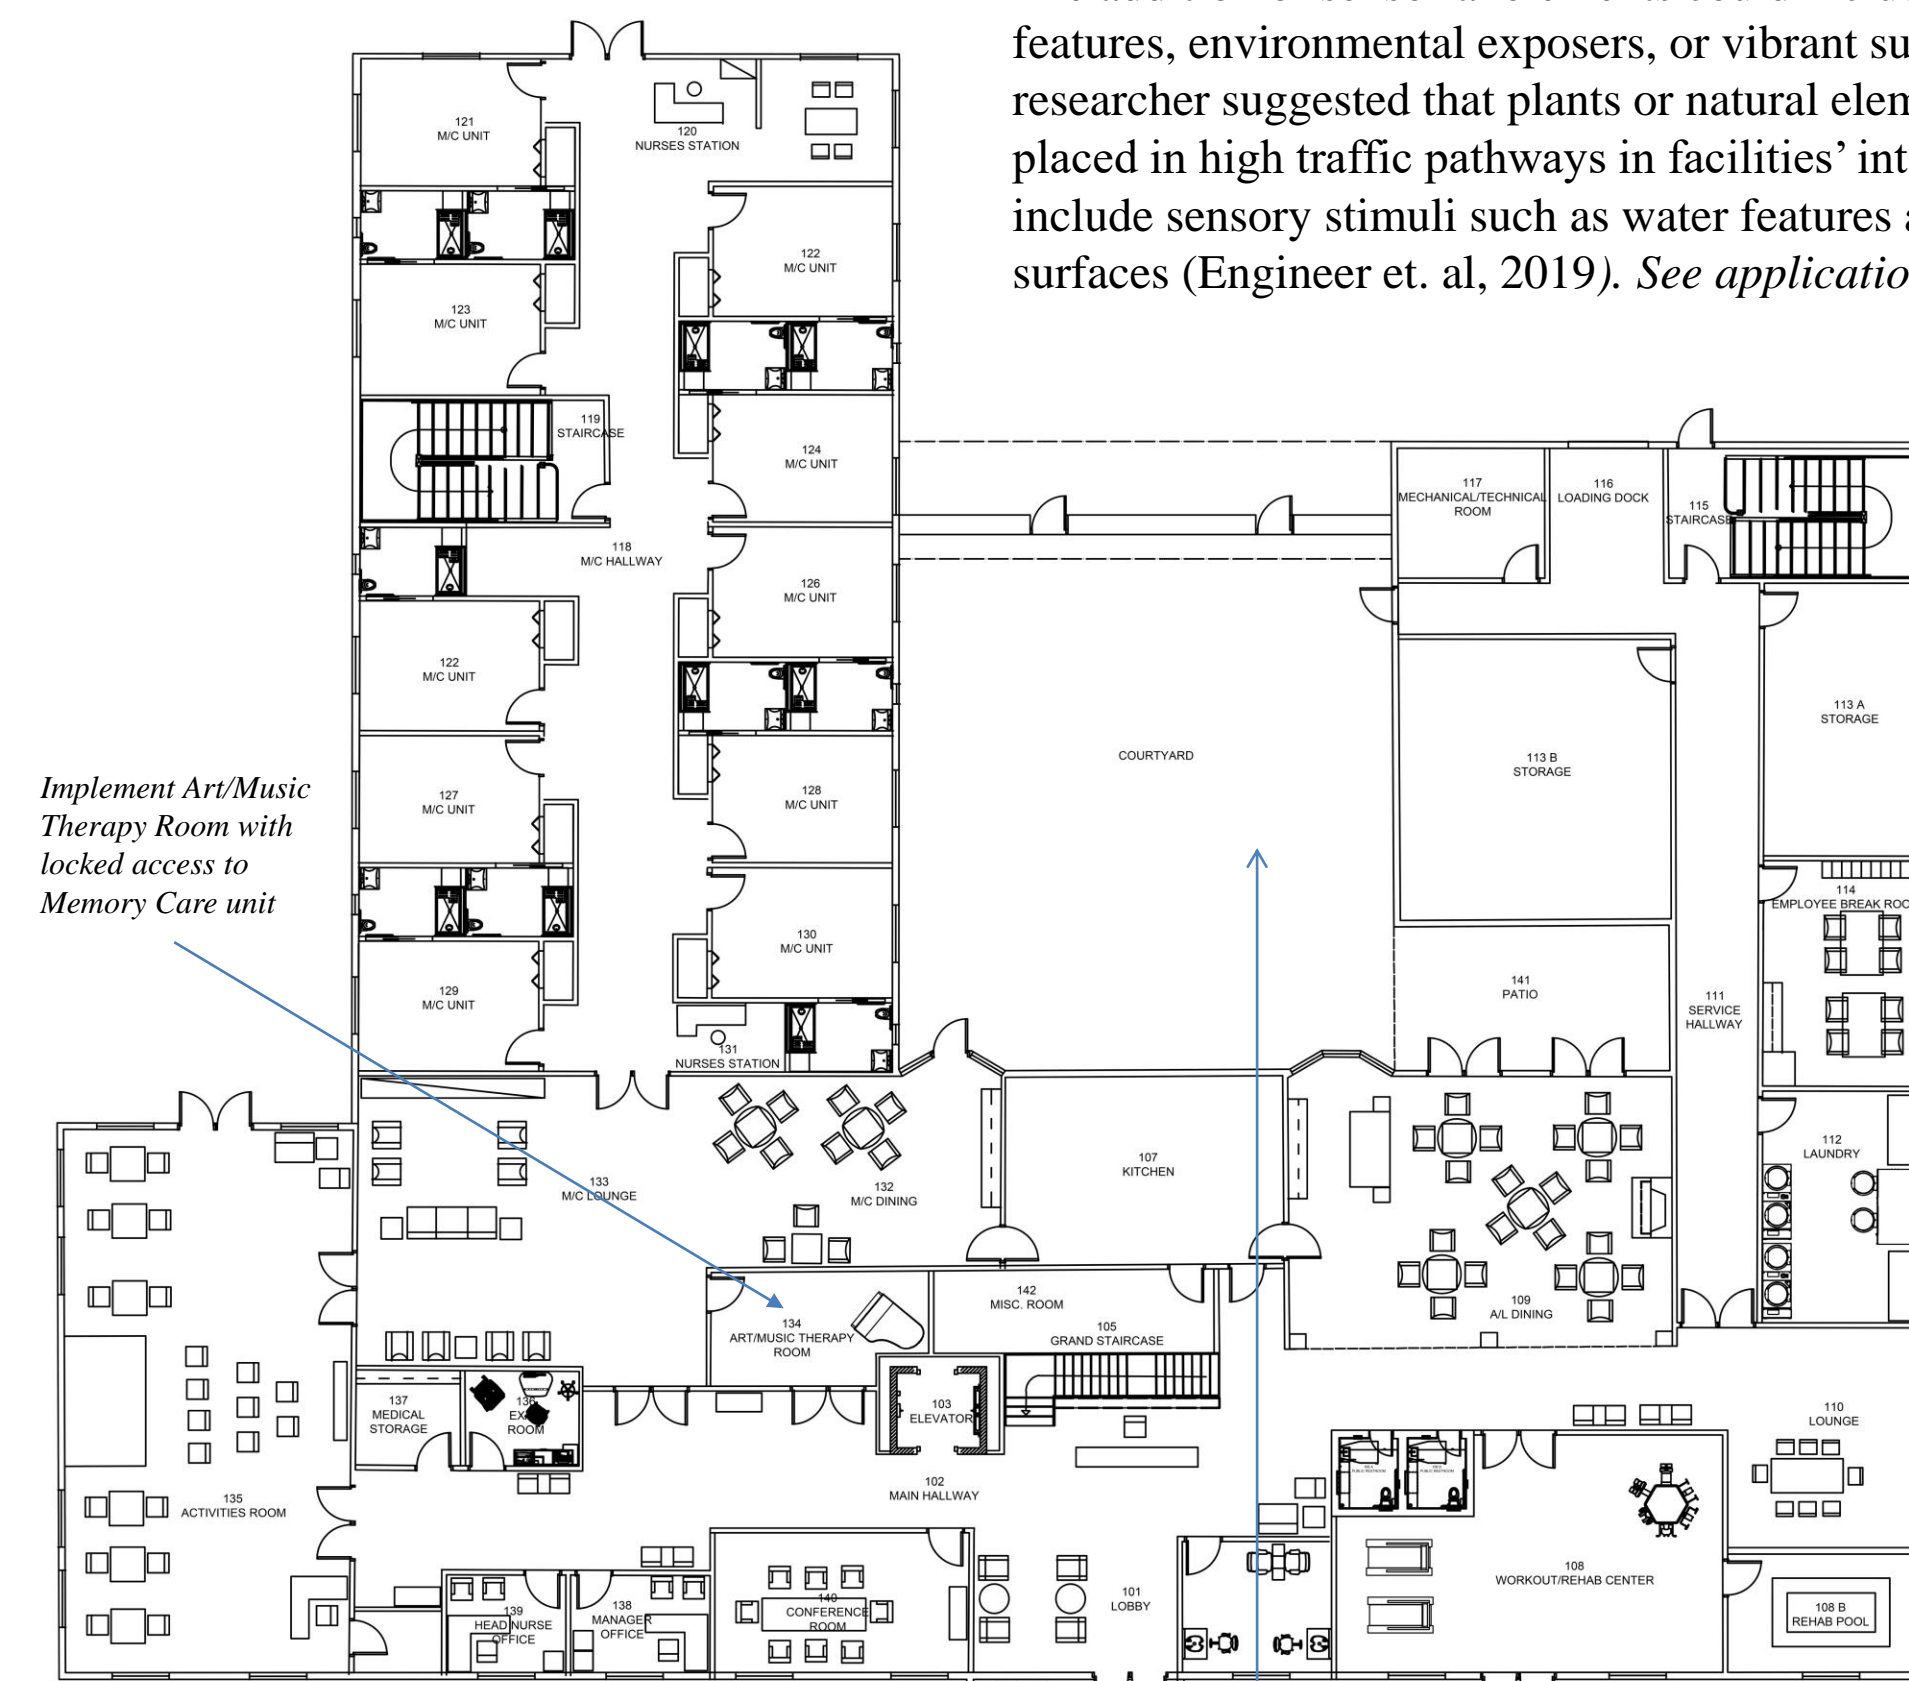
First Level Floor Plan (Image made in AutoCAD by Amanda McNally)
